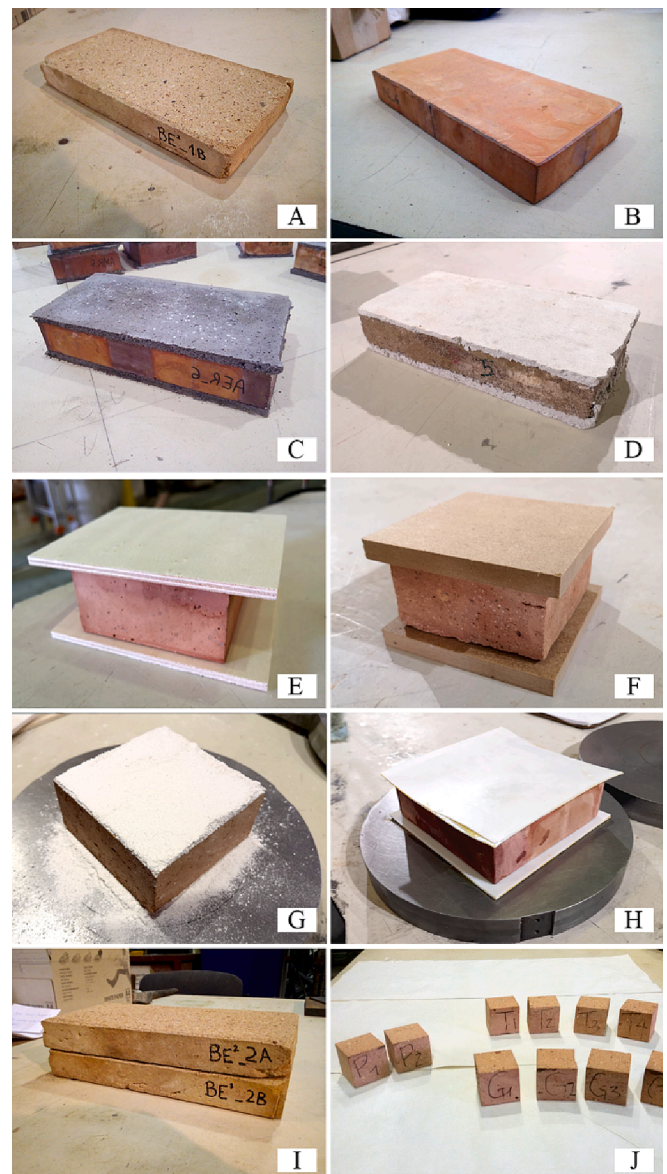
The considered bearing surface treatments for compressive testing. (A) Whole handmade brick with grinded surfaces. (B) Whole mechanically extruded brick with grinded surfaces. (C) Whole brick with cement mortar capped surfaces. (D) Whole brick capped with gypsum plaster. (E) ‘100’ specimen with a sheet of 5 mm ply birch plywood. (F) ‘100’ specimen with a sheet of 12 mm fibreboard (MDF). (G) ‘100’ specimen covered with gypsum powder. (H) Half brick with a leaf of PTFE. (I) Stacked specimen composed of 2 grinded whole bricks. (J) ‘C40’ specimens with grinded surfaces.
